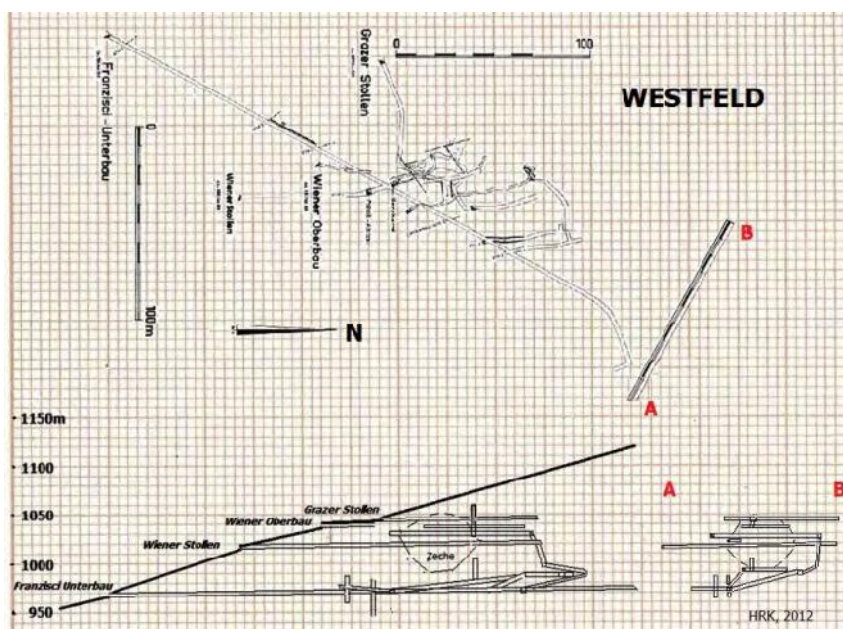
Detailed Mine Plan of the West Field Underground Workings with length-side and front-side Sections in a sketched attempt to show the Mine Building in 3-D
